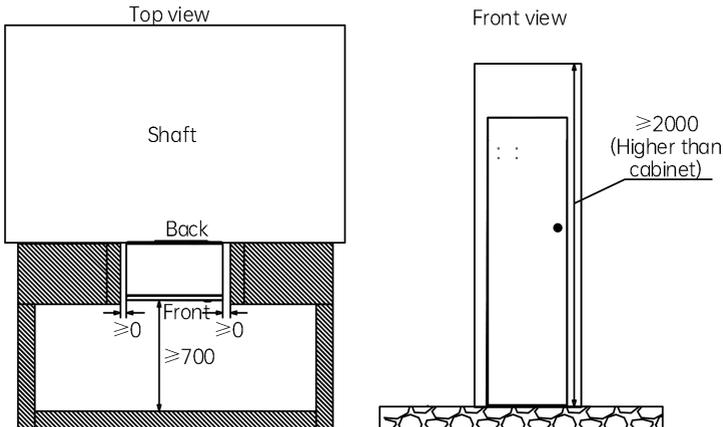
Diagram of MRL cabinet installation space requirements (unit: mm)
